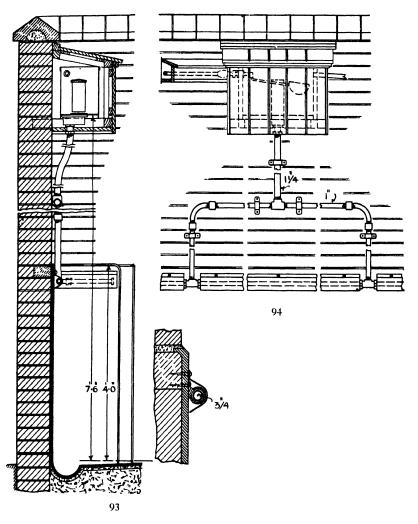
Sectional elevation and details of sparge pipe and shield.
